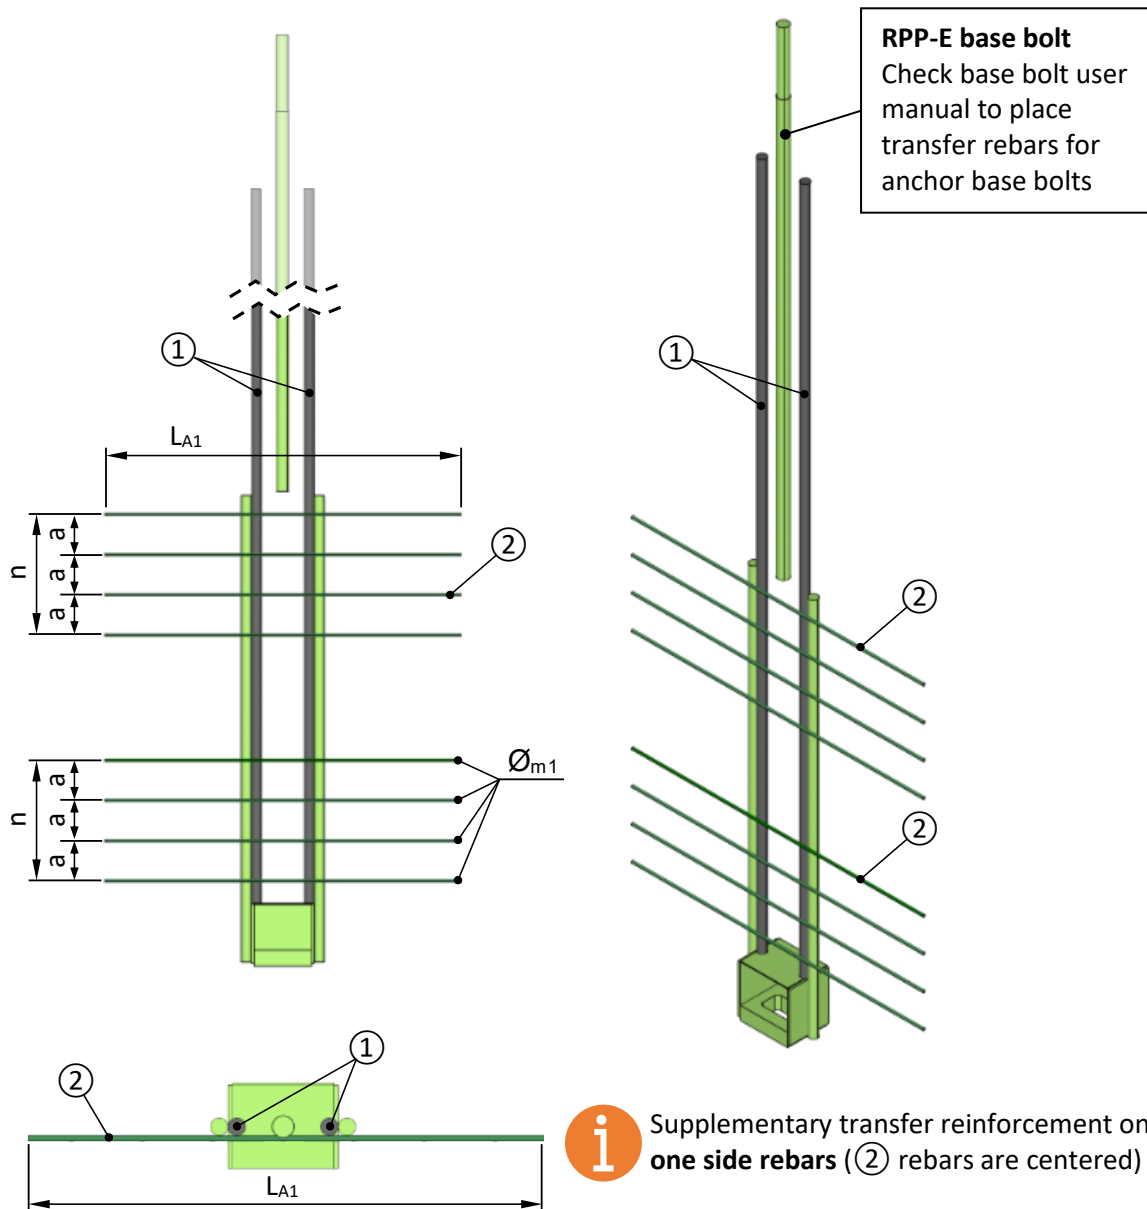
Supplementary transfer reinforcement with one side rebar for RSK-E wall shoe
